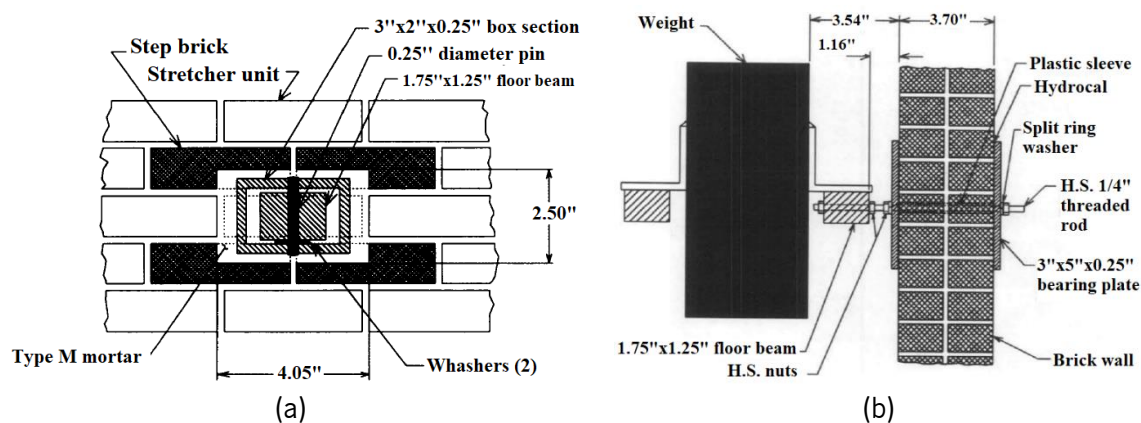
Shake table tests on reduced-scale URM building (Costley and Abrams 1996): (a) front view of floor beam-to-IP wall connection; (b) section of floor beam-to-OOP wall connection.
